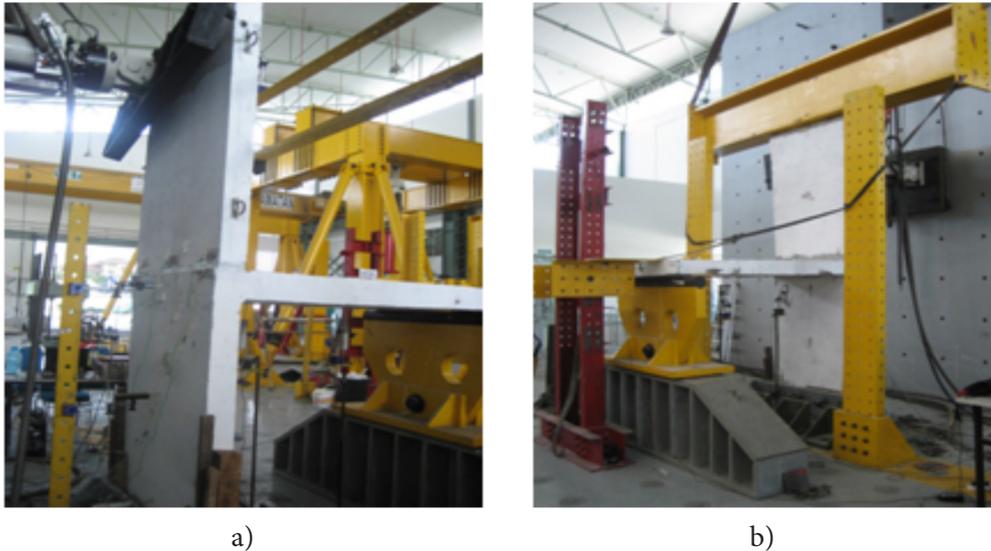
Test setup of wall-slab test, a) without steel beam b) steel beam placed on the top wall
